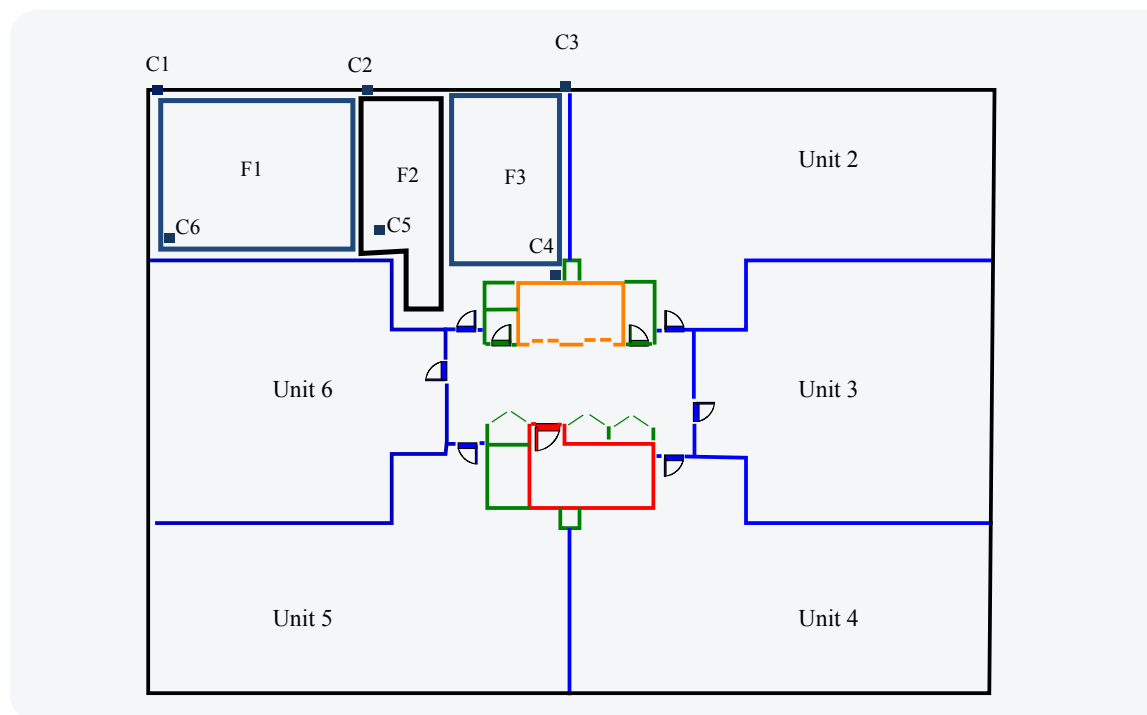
Schematic showing simple structural layout of an apartment in a steel building.
